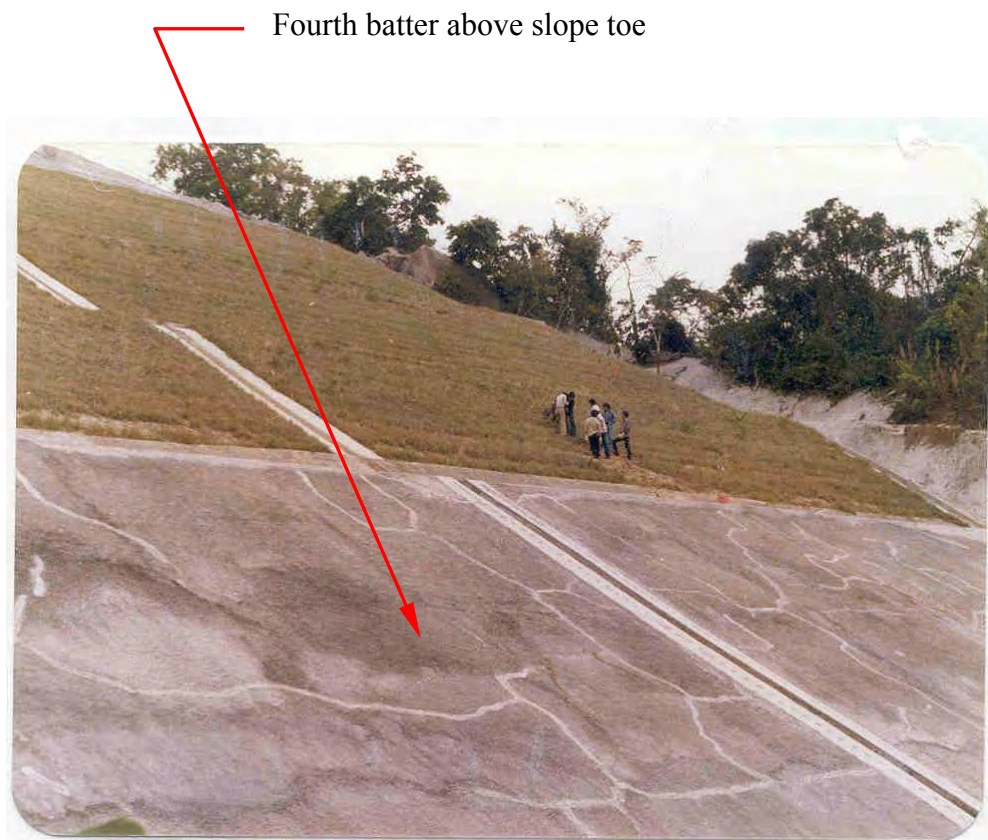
View Northwest across Fourth Batter above Slope Toe showing Extensive Cracking on Shotcreted Surface in 1980
